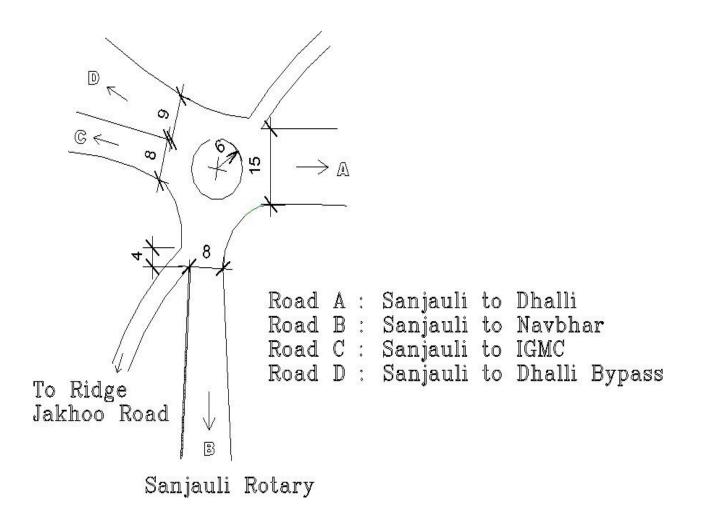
Revit Design of Rotary intersection at Sanjauli Chowk
